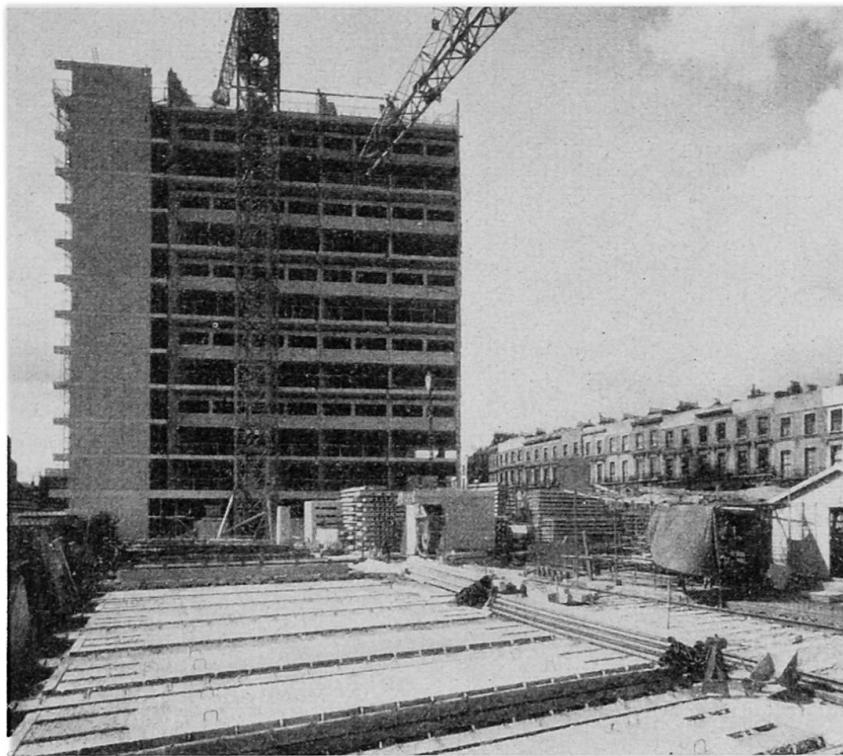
21-storey maisonettes and flats at Warwick Crescent, Paddington, where precasting is done on site.
